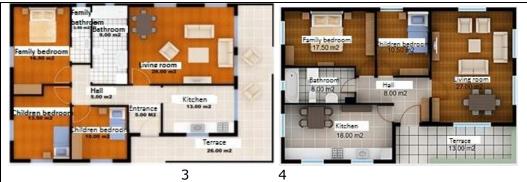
Detached house plans in Turkey numbered 3 and 4 (www.muskon.com)
